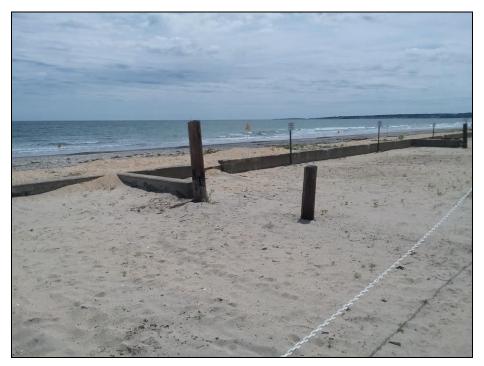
View of low-lying concrete wall, concrete separator walls, and wooden posts.
